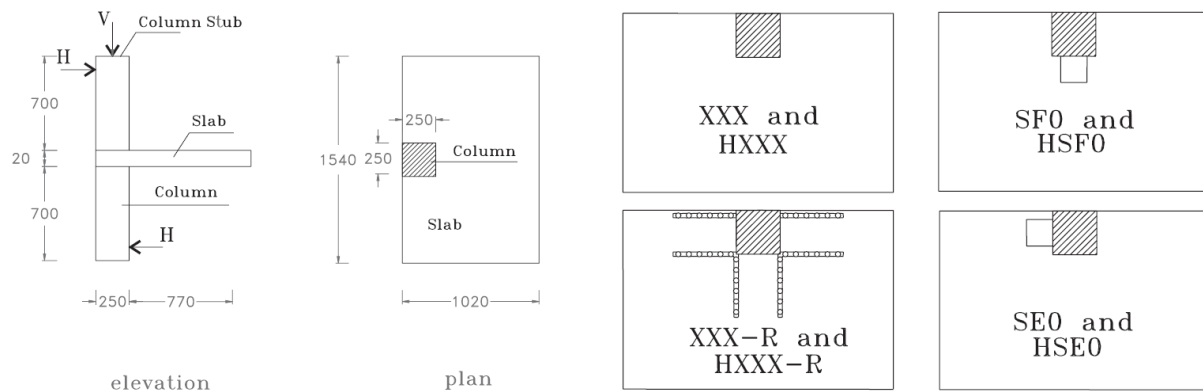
Specimen dimension and plan view, adapted from El-Salakawy et al. [51].
